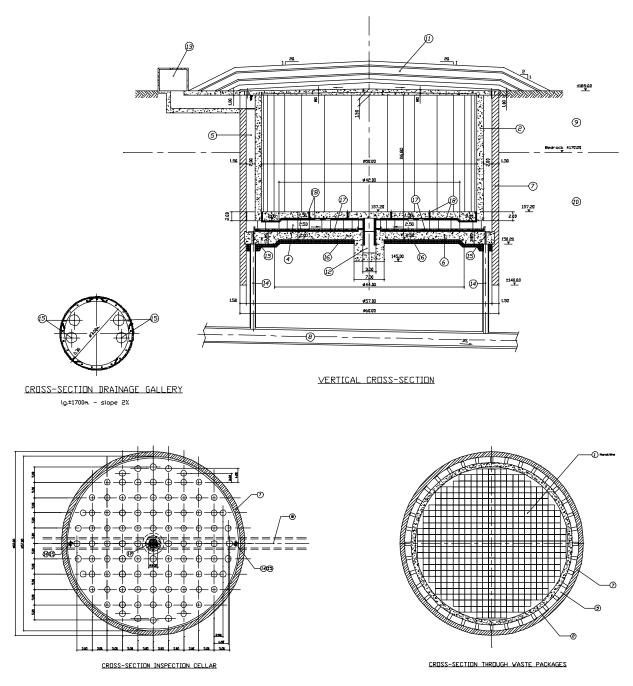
Plan and cross-section of the cylindrical solution with double shells for the Fleurus-Farciennes site
